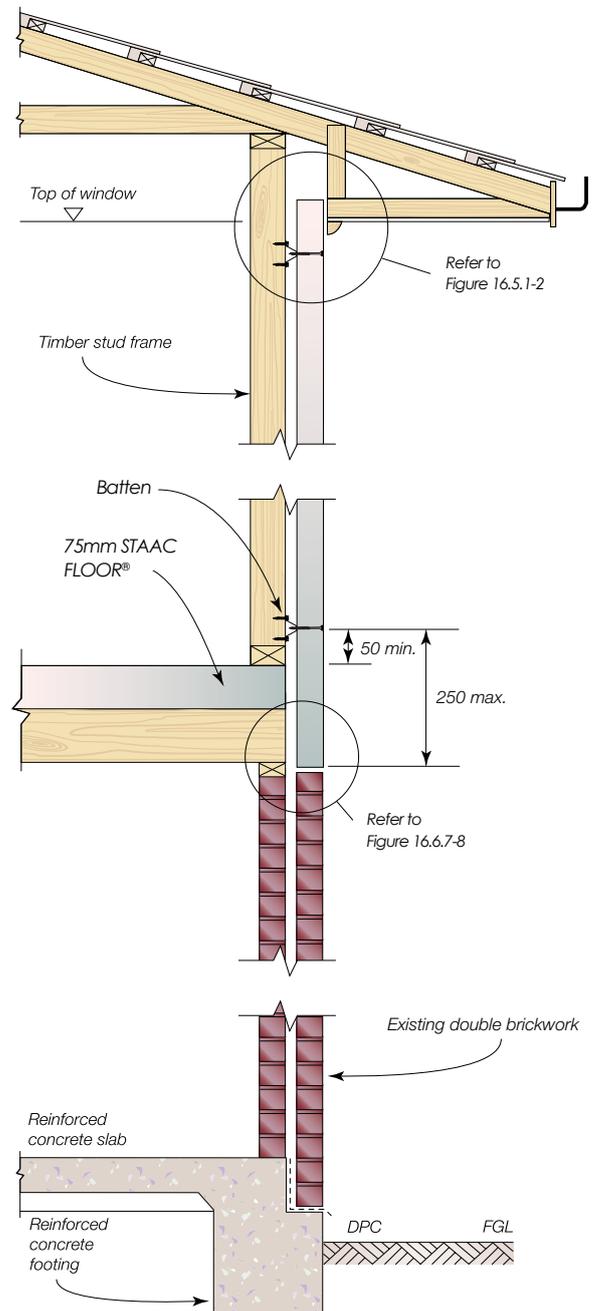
Multi-storey addition – isometric view detail
